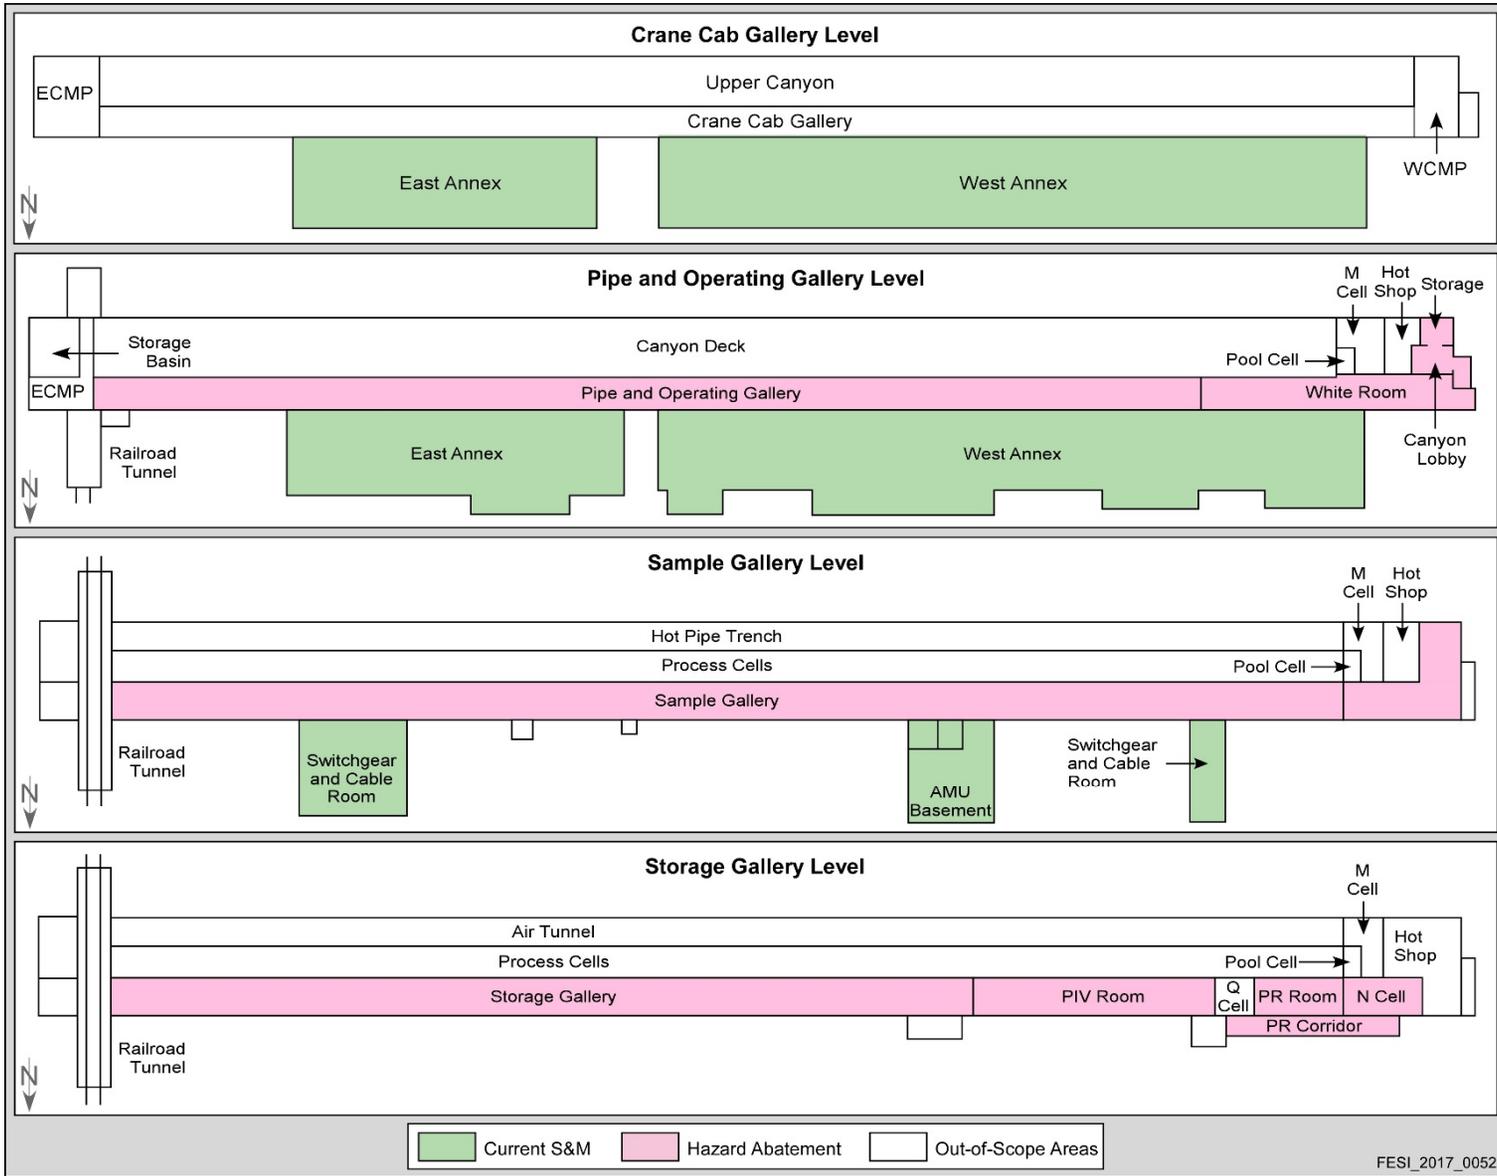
Alternative 2 Plan View – Proposed Actions per Level
